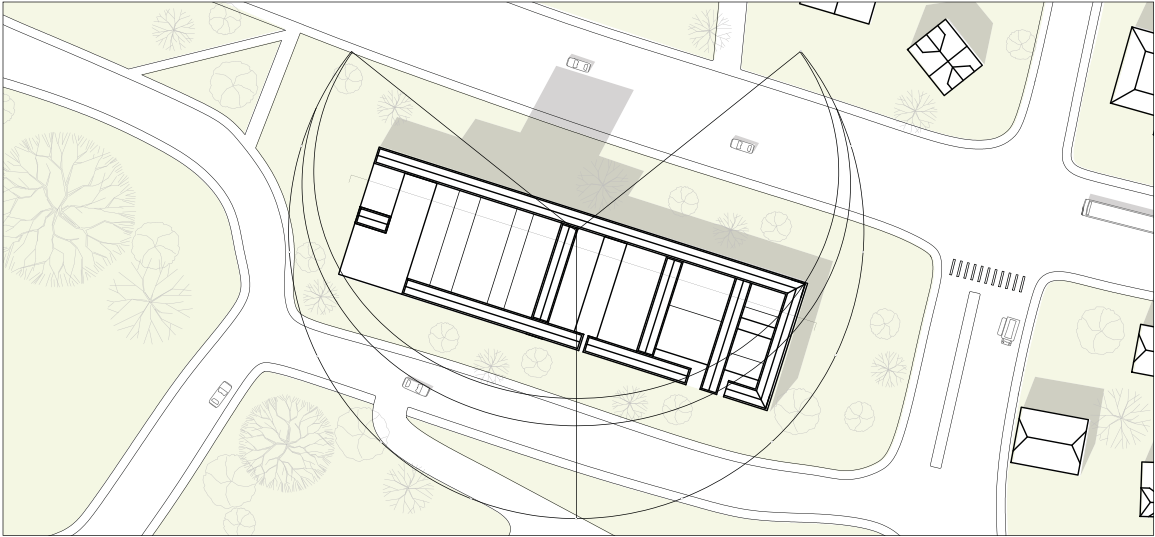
Examining Bagsværd Church by Jørn Utzon built in Copenhagen, 1976 and located at 55.7° N. This study explores the building through plan and section, exploring volume and aperture of space. Base section by Paul Lewis, Marc Tsurumaki, and David J. Lewis, *Manual of Section*.
